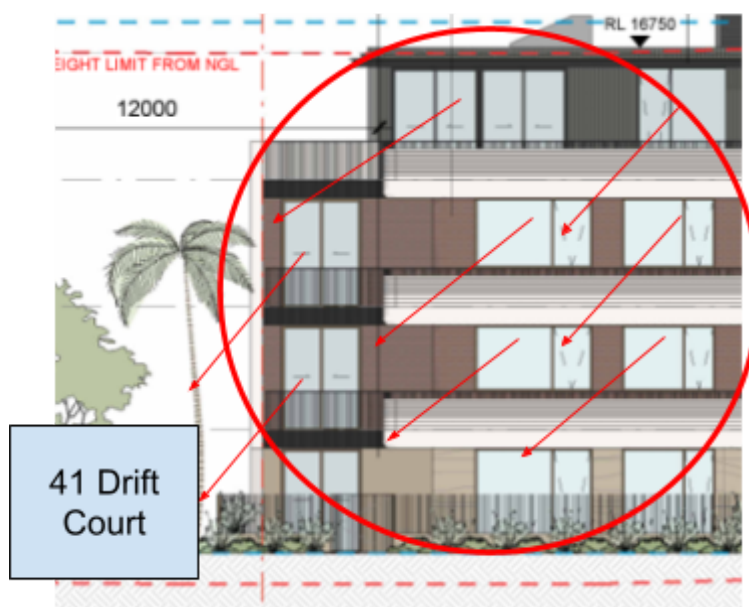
and 4 below show the proposed Building F (back of the building and the side of the building) in relation to 41 Drift Court. There are more than 50 windows and 30 balconies (Building F and Building E) that will look directly into the alfresco area, pool, master bedroom and the two second level bedrooms. The top floor balcony has planter boxes for privacy which will not provide adequate privacy to our house. During the consultation process I requested a cross section diagram showing sightlines from Building F into our ground floor and second floor. I was promised this would be sent, however it was never received.
